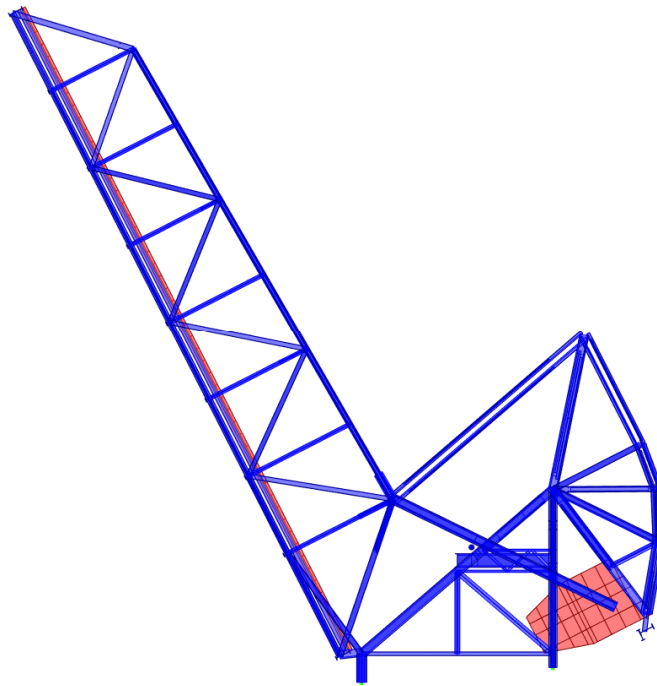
Screenshot of LaSalle Causeway Bascule Bridge Finite Element Model- 63o Opening - North View
